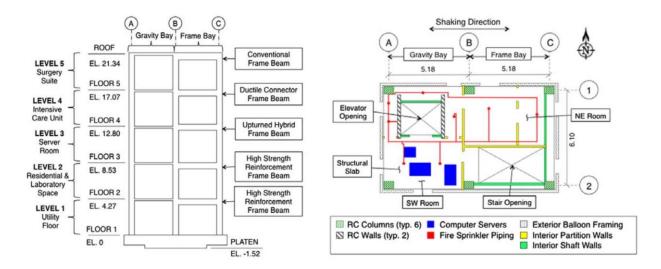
Elevation view (Left) and Plan View (Right) [38].
